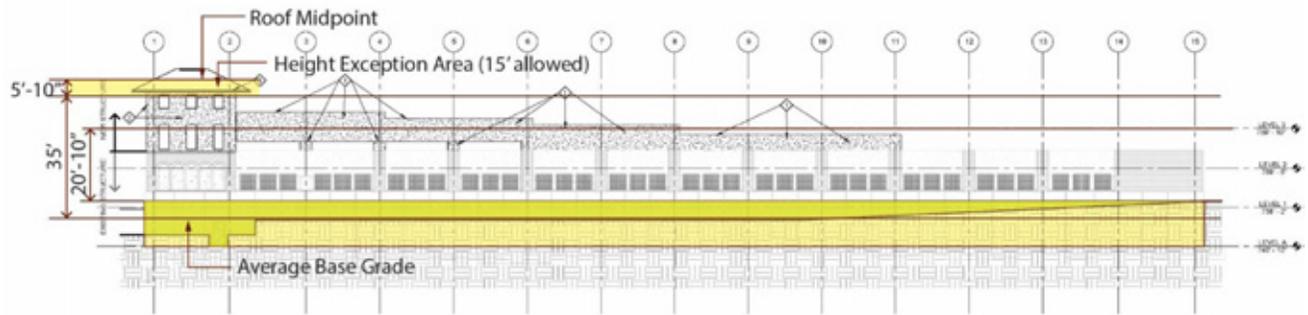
West elevation drawing of proposed parking garage vertical expansion with City's height calculation notes.
